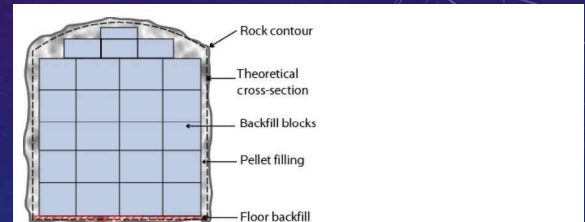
Cross section of a backfilled KBS-3V deposition tunnel showing the three main components of the backfill. 1) precompacted blocks, 2) pellet fill and 3) material placed under the blocks to provide stable foundation for the blocks (Keto et al. 2009a).
